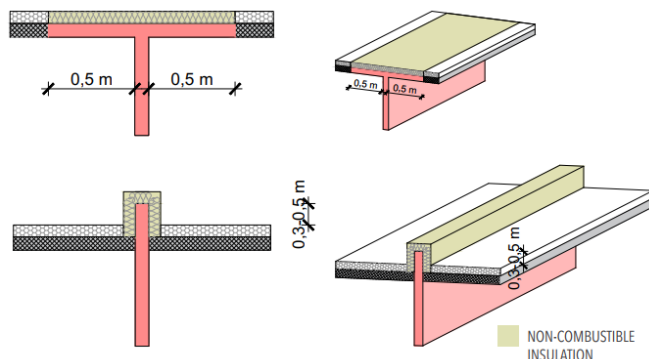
Roof protection - non-combustible material around the finishing of a fire wall [17].
